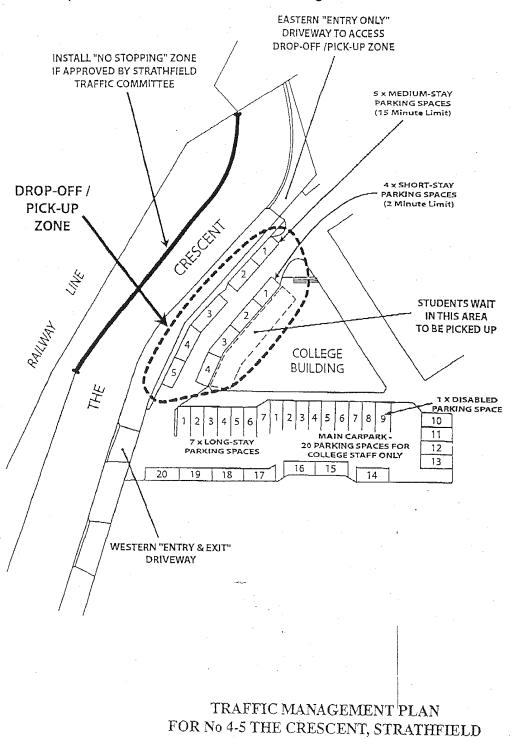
Traffic Management Plan (Source: L&E Court Appeal No. 10606/2001)
